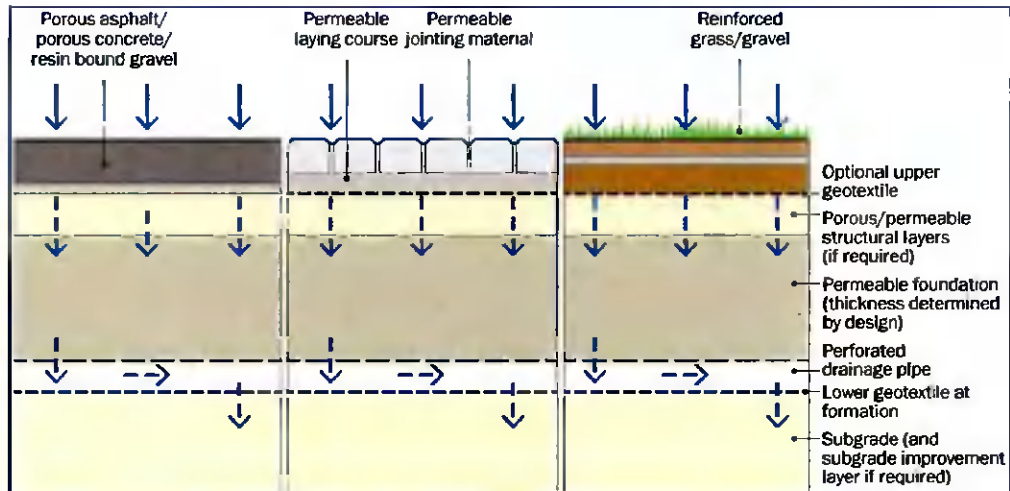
Detail of Type B Pervious Paving (CIRIA C753)
